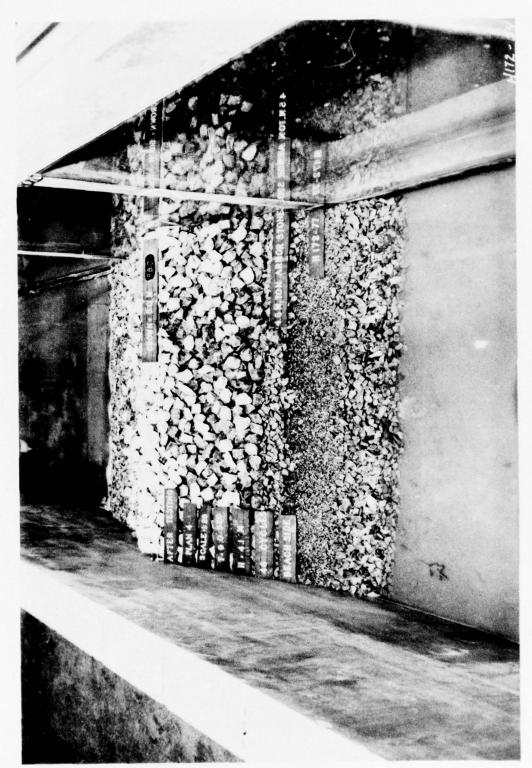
Beachside view of Plan 4 after attack of 9-sec, 4.1-m waves at a swl of +2.35-m PBD
